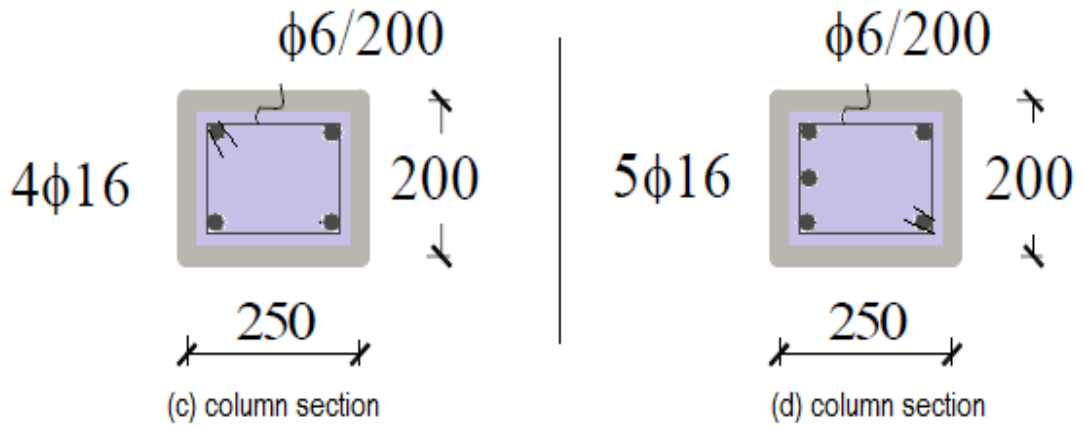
(c) Bottom section, (b) Upper section of the columns.
